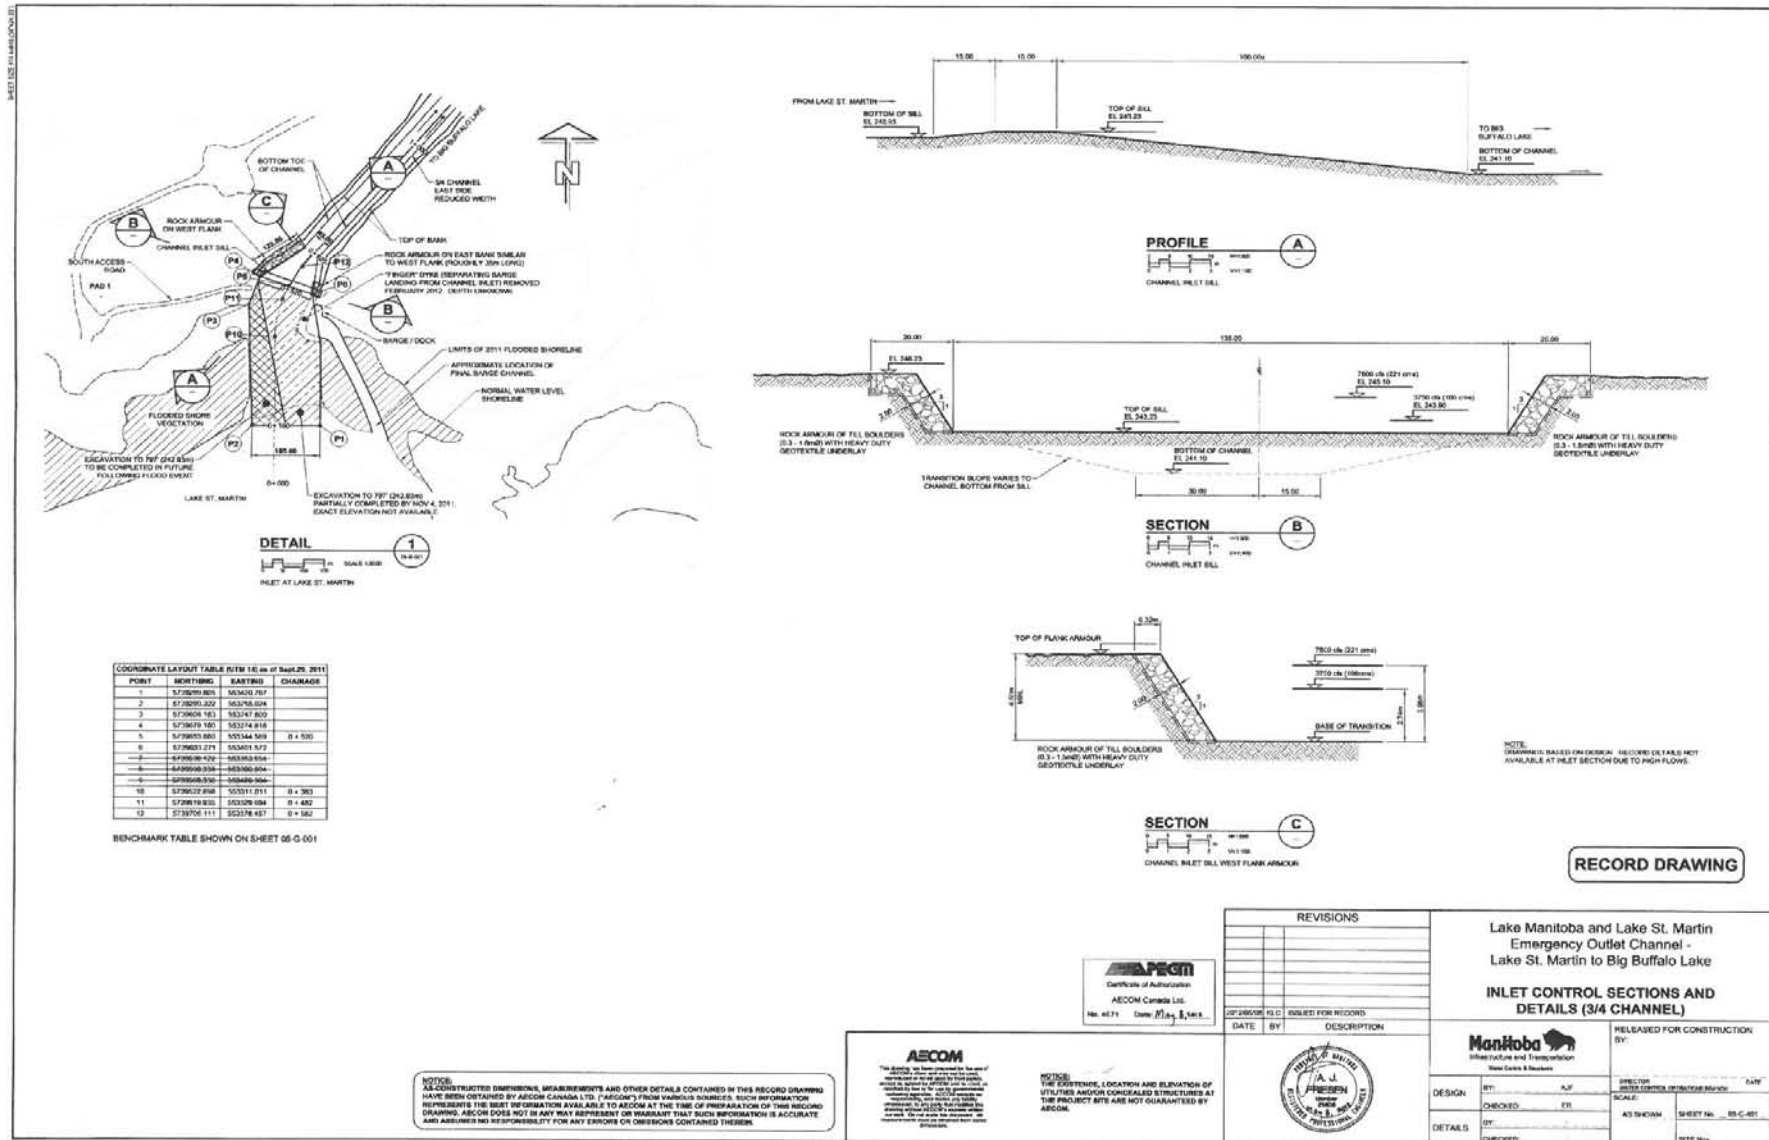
Reach 1 Inlet Site Plan and Construction Details
